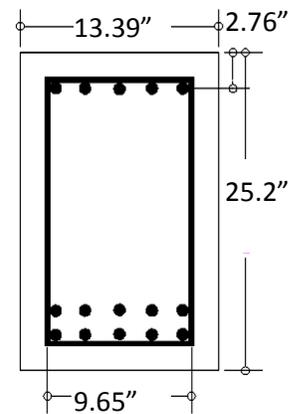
Typical beam section for RC2 series tested by Rahal and Collins.
